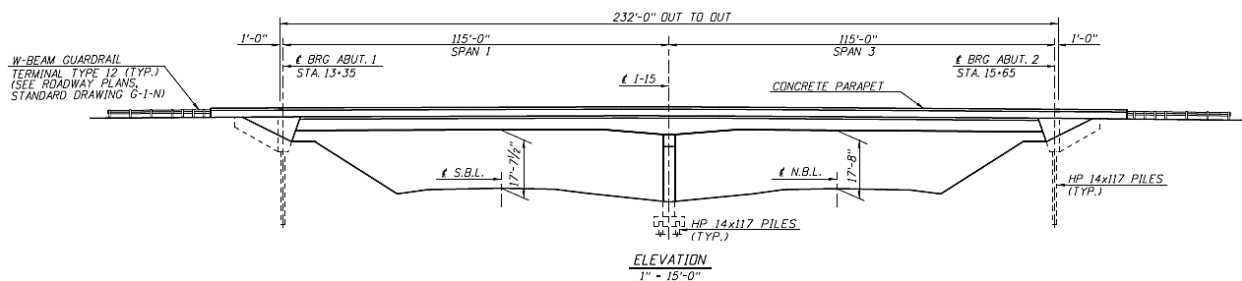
Elevation View of the SH-22 over I-15 Bridge at Dubois (NTS)
